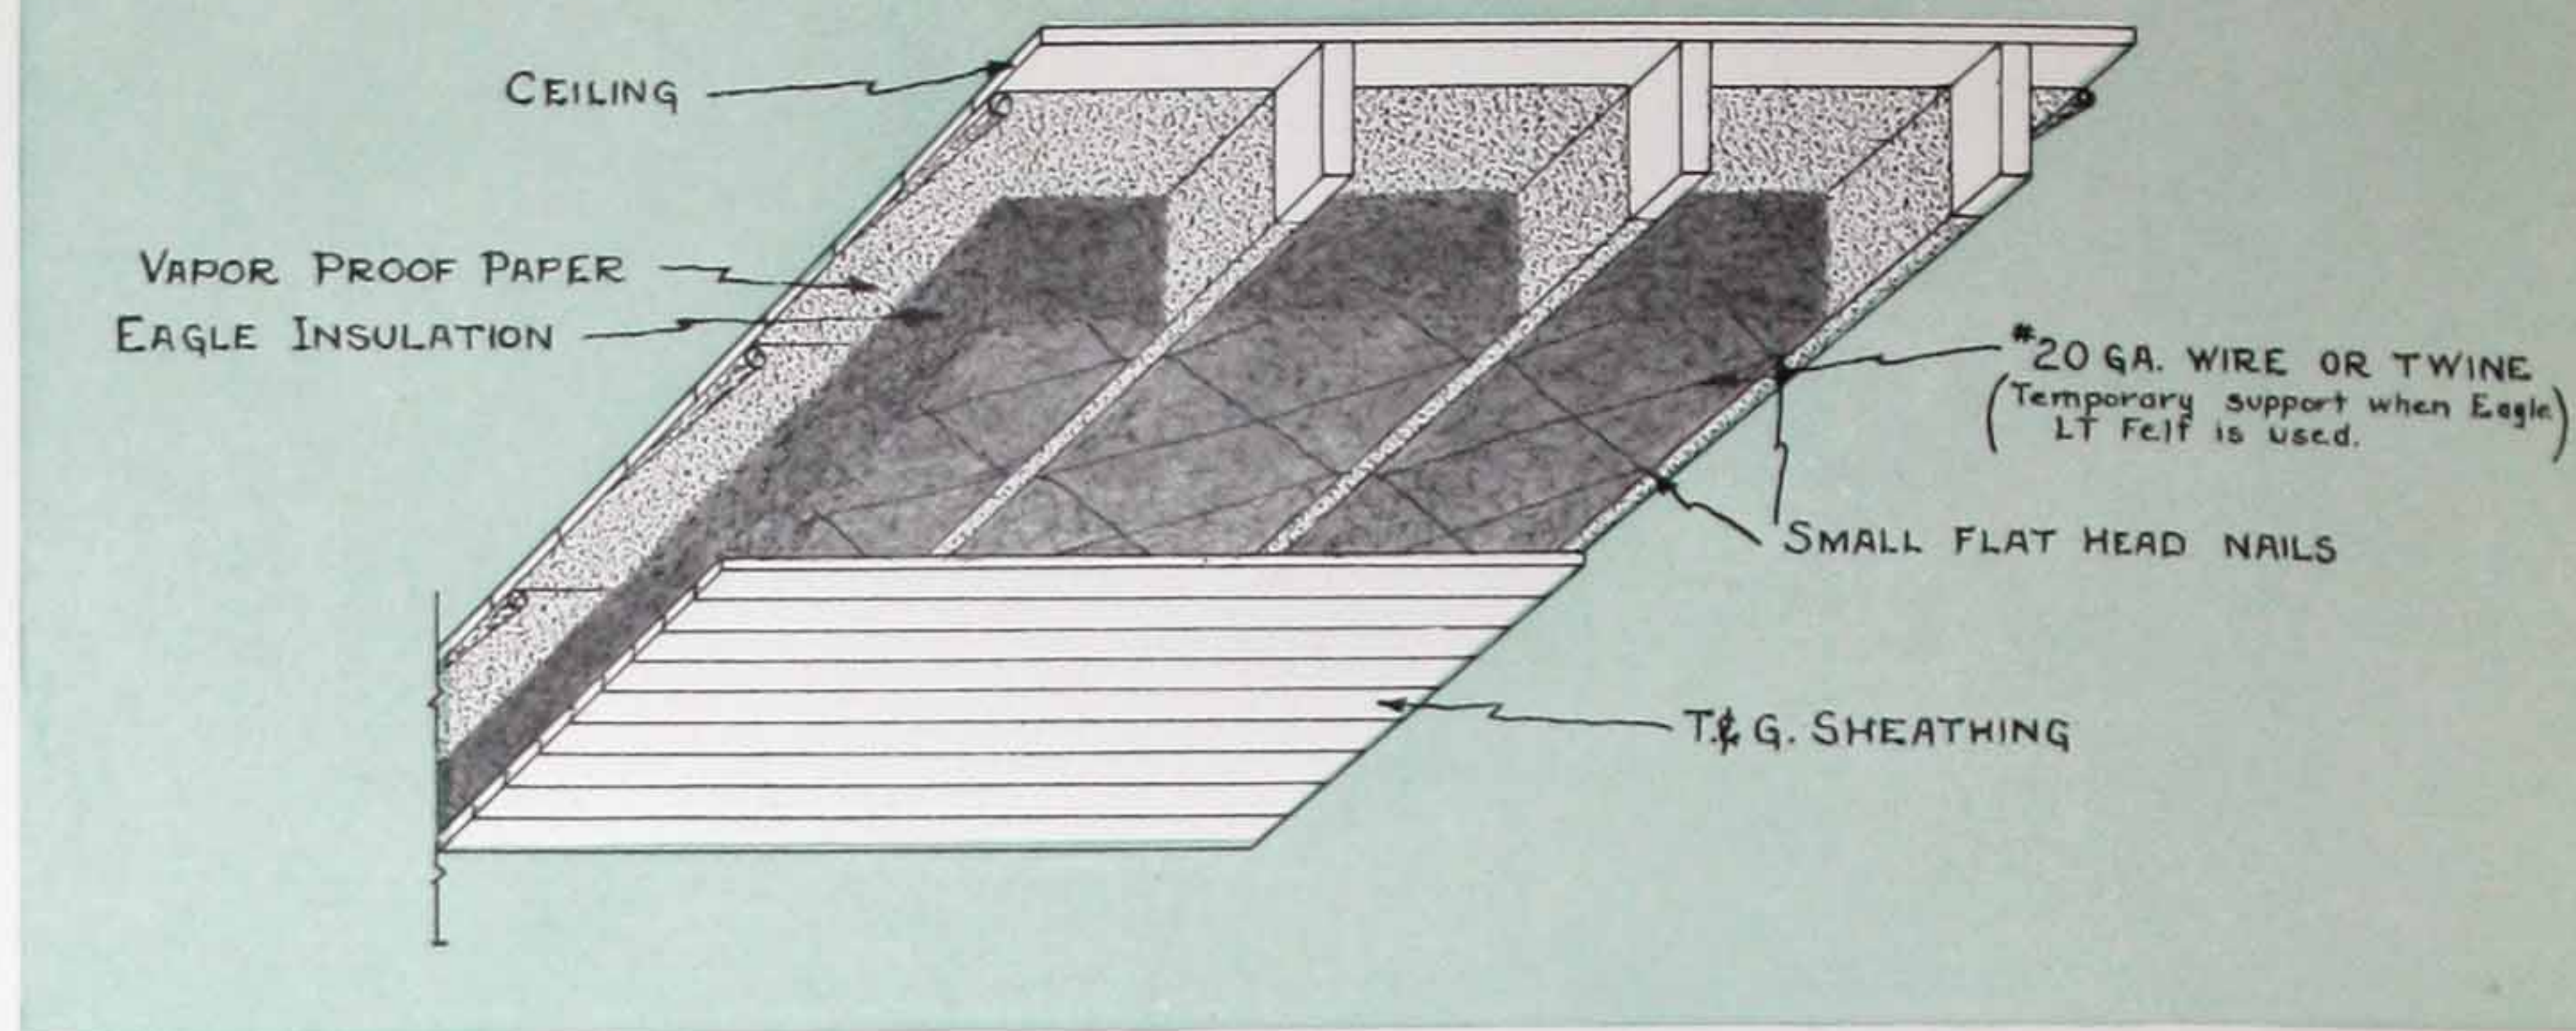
Details of refrigerator ceiling when wood finish is desired.
